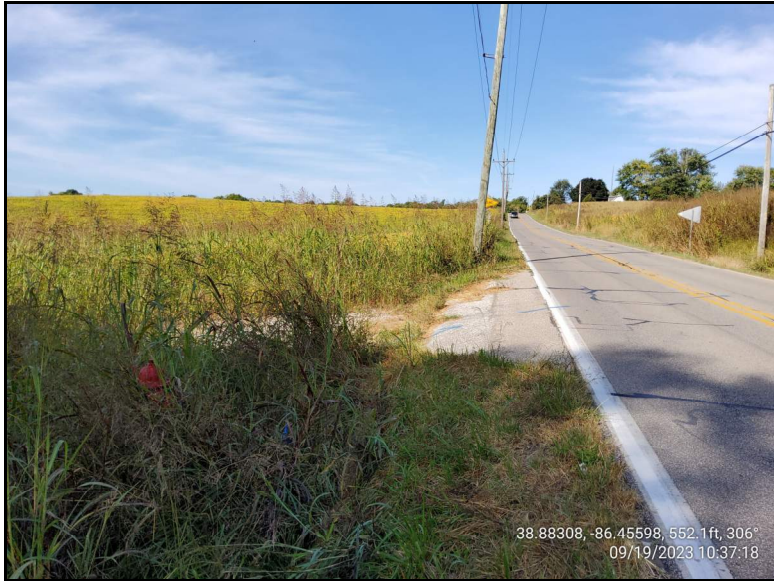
Taken from SR 58 east of the CMP, facing southeast showing roadside vegetation south of SR 58.
